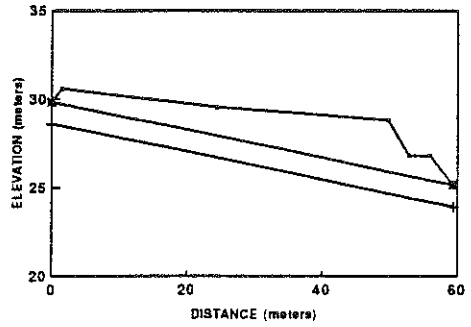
Installation of 0.76 m Pipe at Station 162+00
